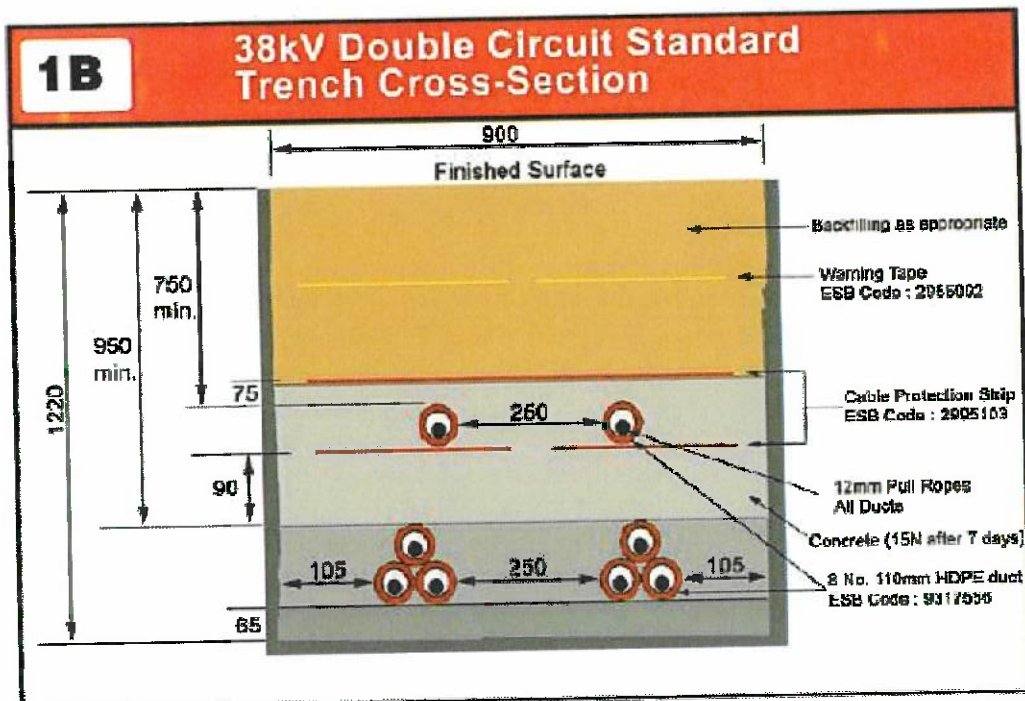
Example of ESB 38V Twin Circuit Cross Section which will likely run through Site 4 roadway.
